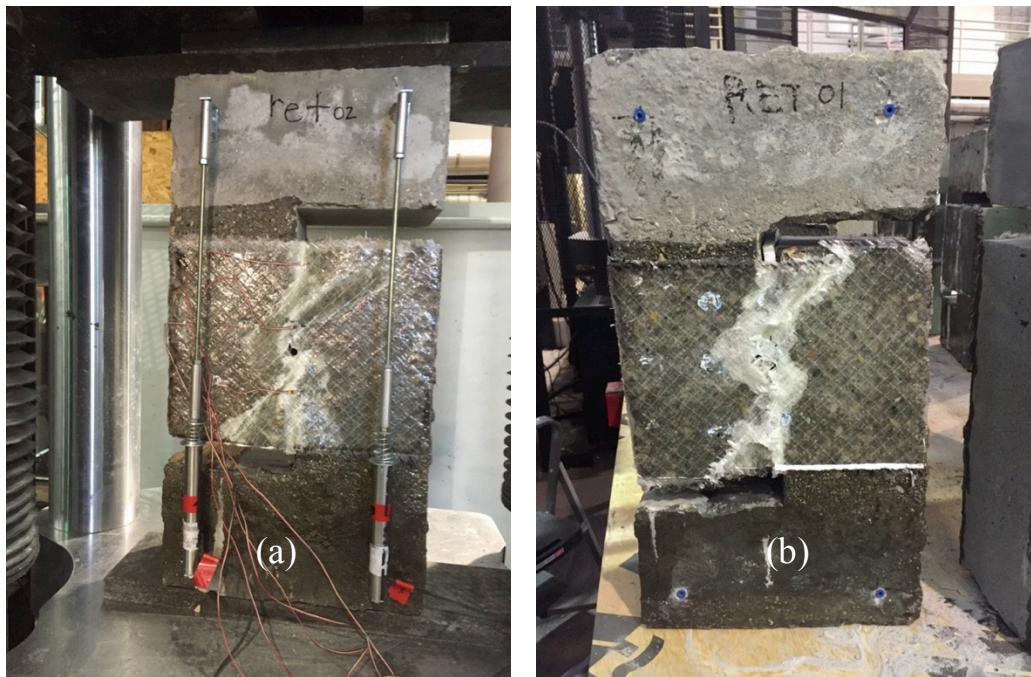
Typical failure: (a) surface retarder with single-pass wash specimen; (b) surface retarder with multiple-pass wash specimen.
